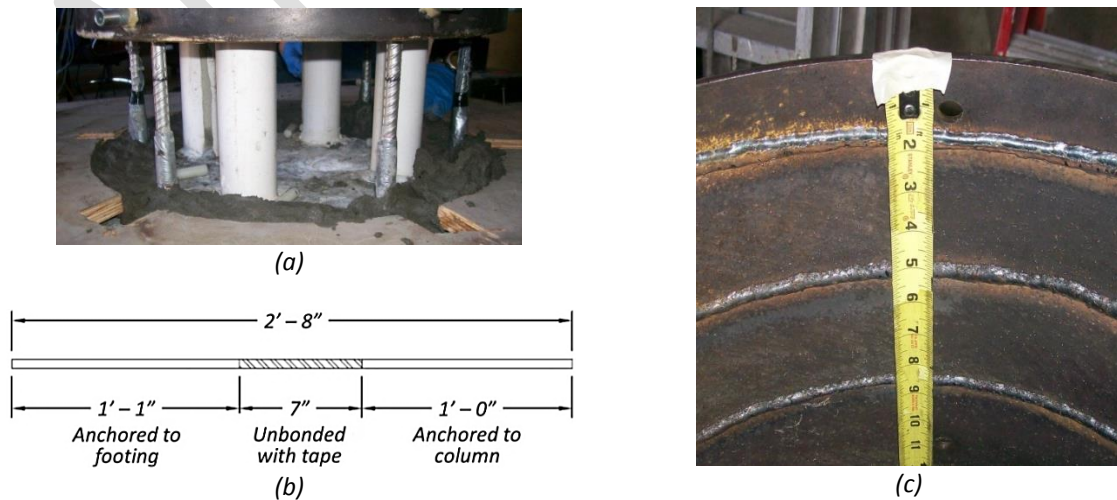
Internal energy dissipators: (a) dowels during column placement; (b) construction details; (c) circumferential weld beads on the interior surface of the outer shell.
